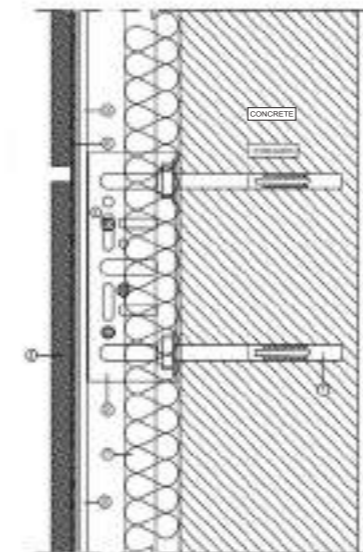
DETAILED DRAWINGS OF ARKTECH GL SYSTEM SECTIONS PLANOS DETALLE DE SECCIONES DE ARKTECH GL SYSTEM
